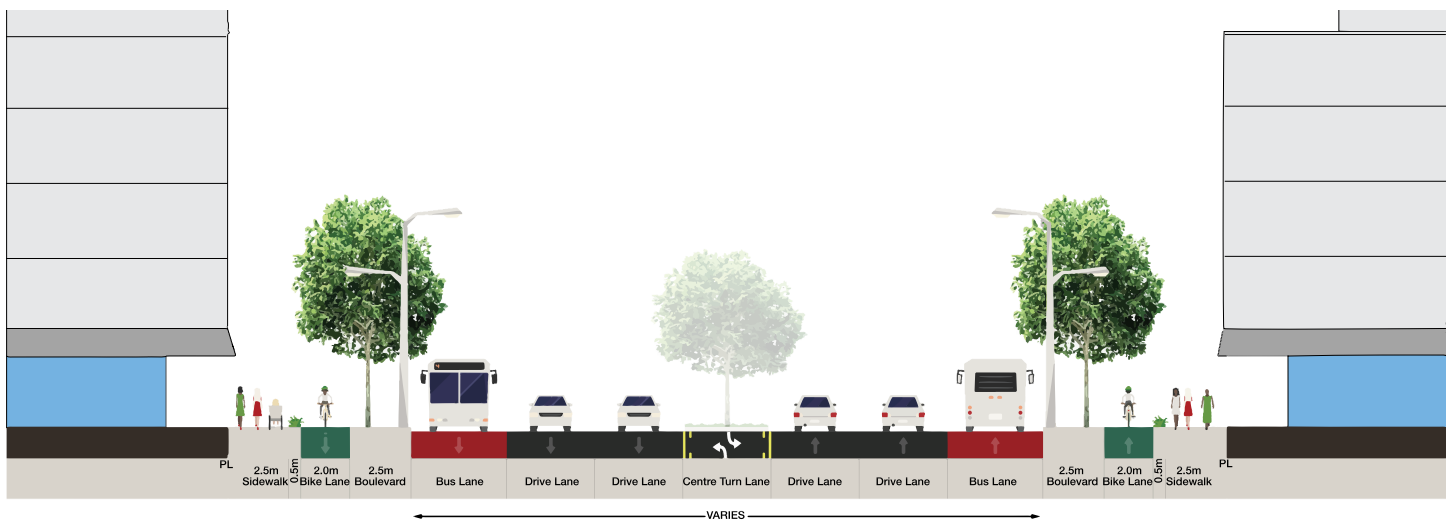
Long-term conceptual cross section for Douglas Street within an expanded Right of Way (generally 35-40 metres)
